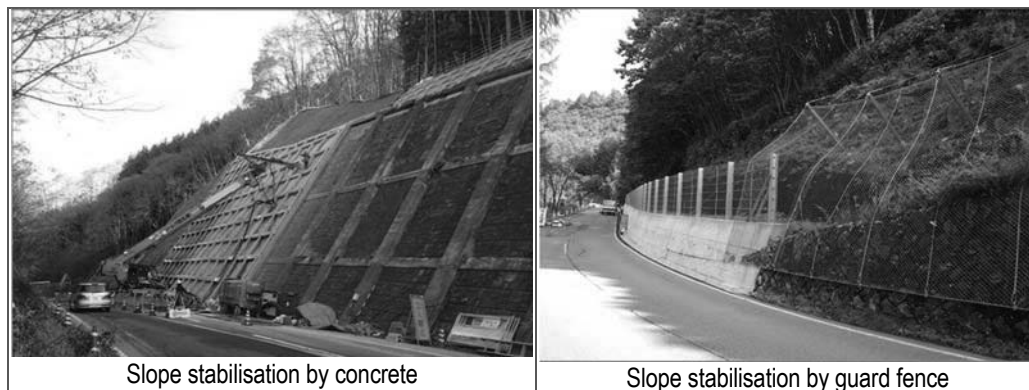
Examples of Slope Stabilisation Works in Japan
